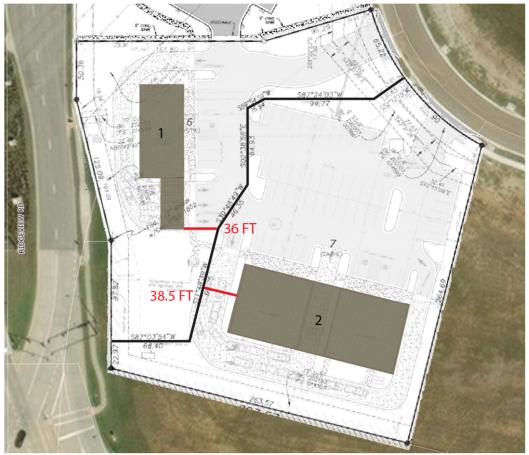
Approved Final Plan (PL22-08F) with the proposed plat superimposed.
